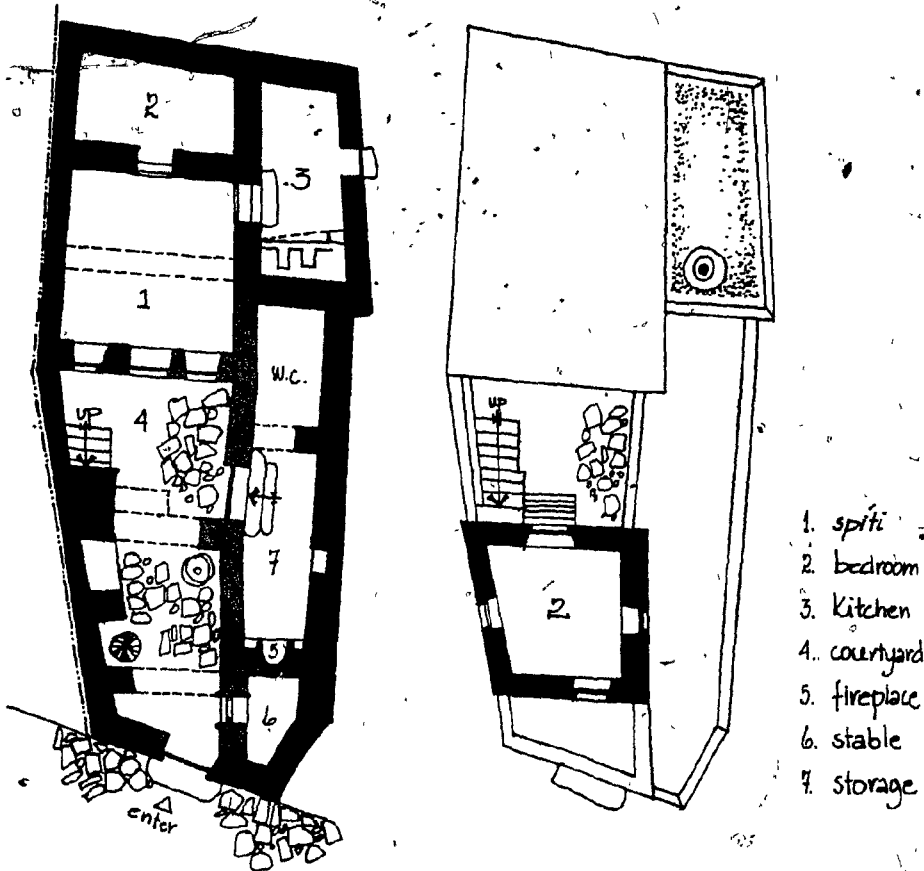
Amorgos. Towards a two storey building transitional form of house in Tholara.
